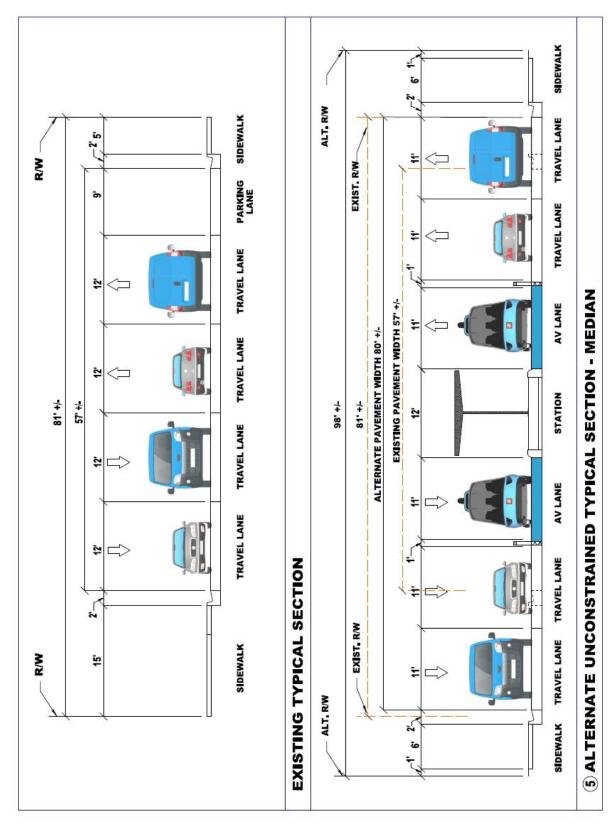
West Corridor Existing and Alternate Unconstrained Typical Section with Median Station -Park Street
